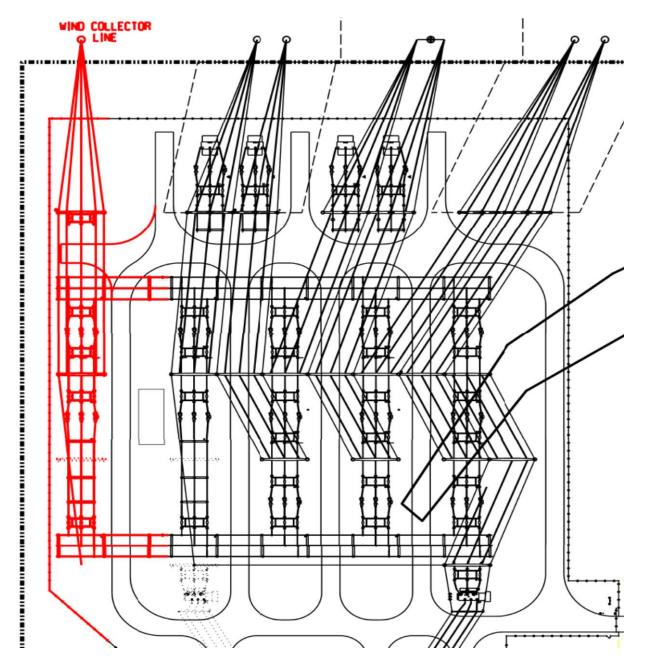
GEN-2014-049 ITCGP Thistle substation site plan
